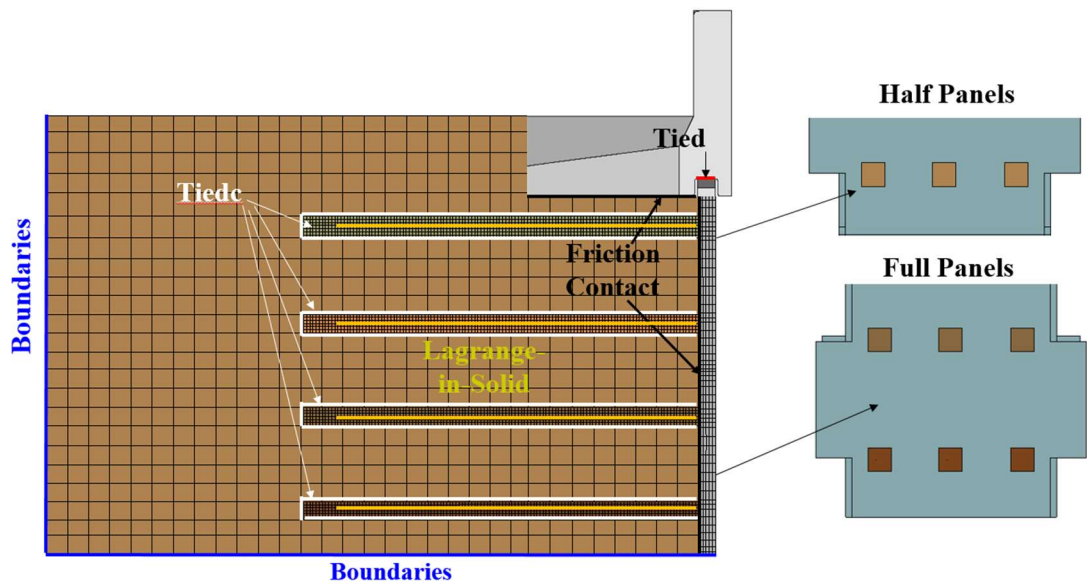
Typical details of the MSE wall for TL-3 through TL-5
